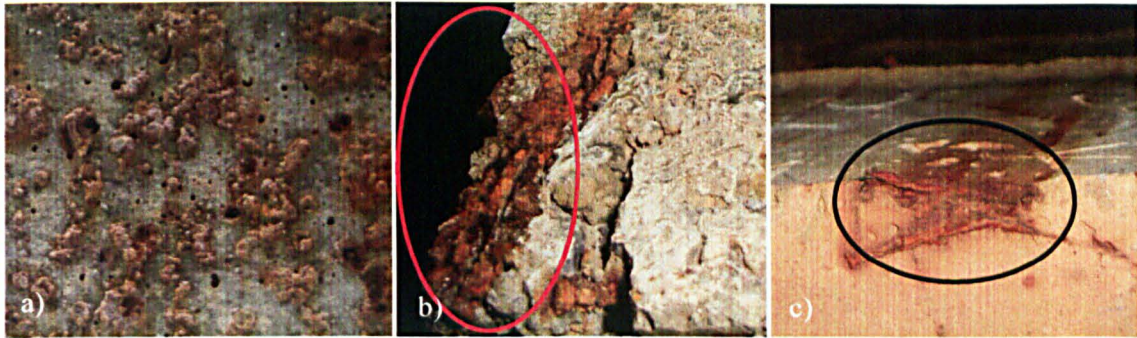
Corroded fibres exposed to the concrete surface after 10 months of wet-dry cycles.
